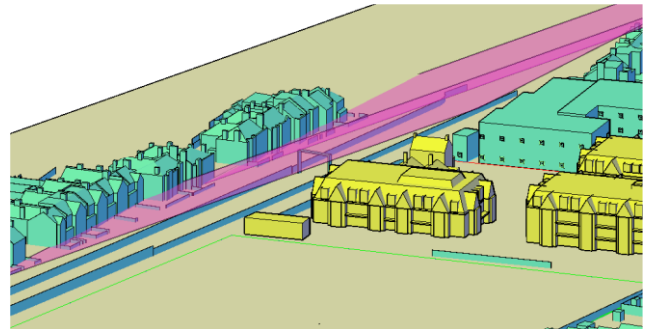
25-degree plane from assessed windows at 1-40 North Worple Way
